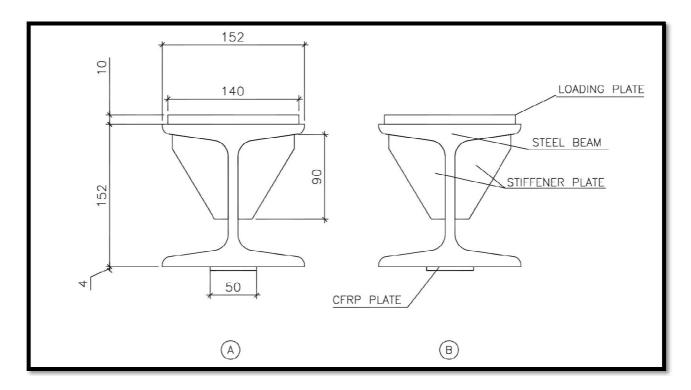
A: Dimensioning Details of Strengthened Test Beams without End Anchorage. B. Component Details of Strengthened Test Beams without End Anchorage. (Beam 2, Beam 4, Beam 5 and Beam 6).
